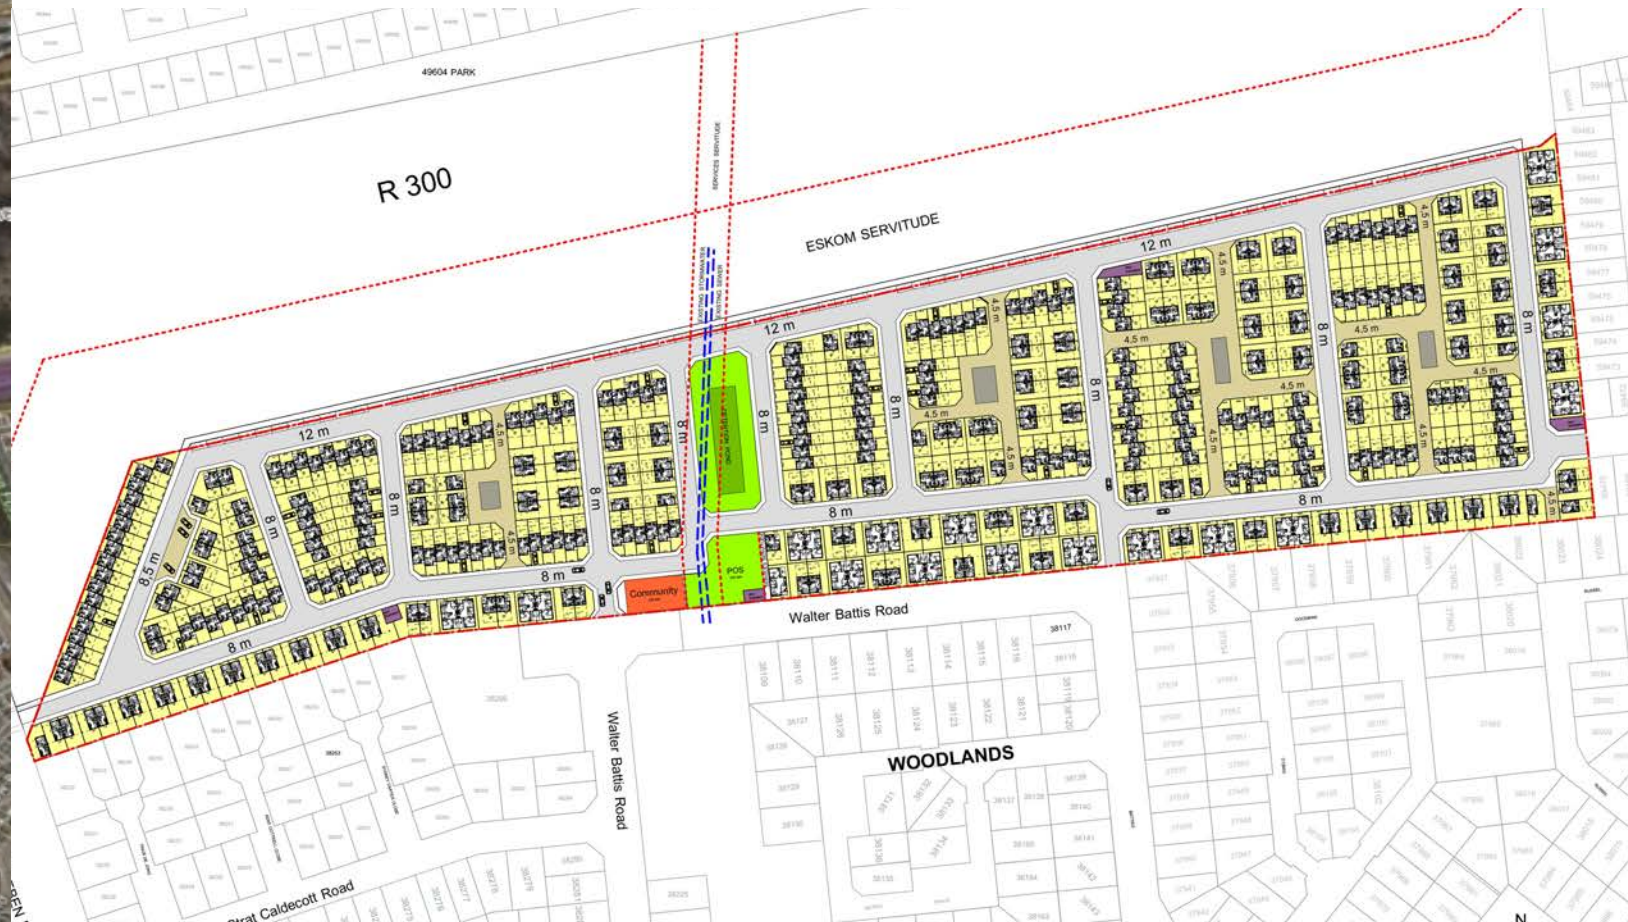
Site Development Plan showing layout of BNG housing units on erven as well as detention pond and public open spaces.
